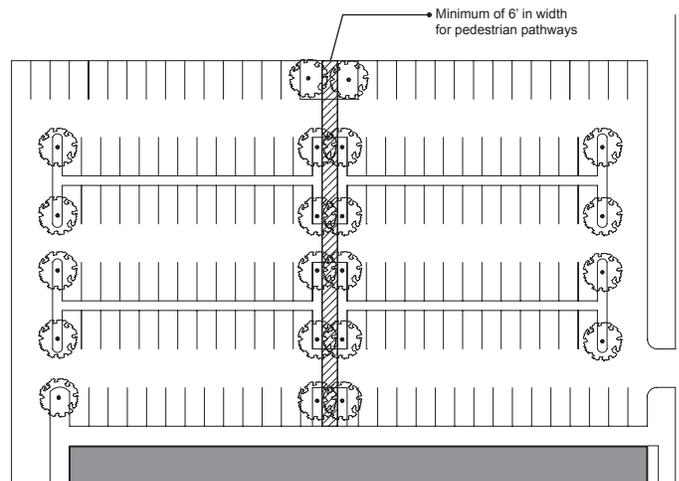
(2). Parking Lot Pedestrian Walkway.
